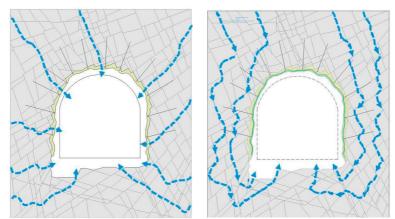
Drawing showing the hypothesized effect on ground water flow of the waterproof and undrained SCL structure. Left: SCL without any waterproofing. Right: SCL with undrained waterproofing in walls and crown and a drained invert. (Holter 2014).
